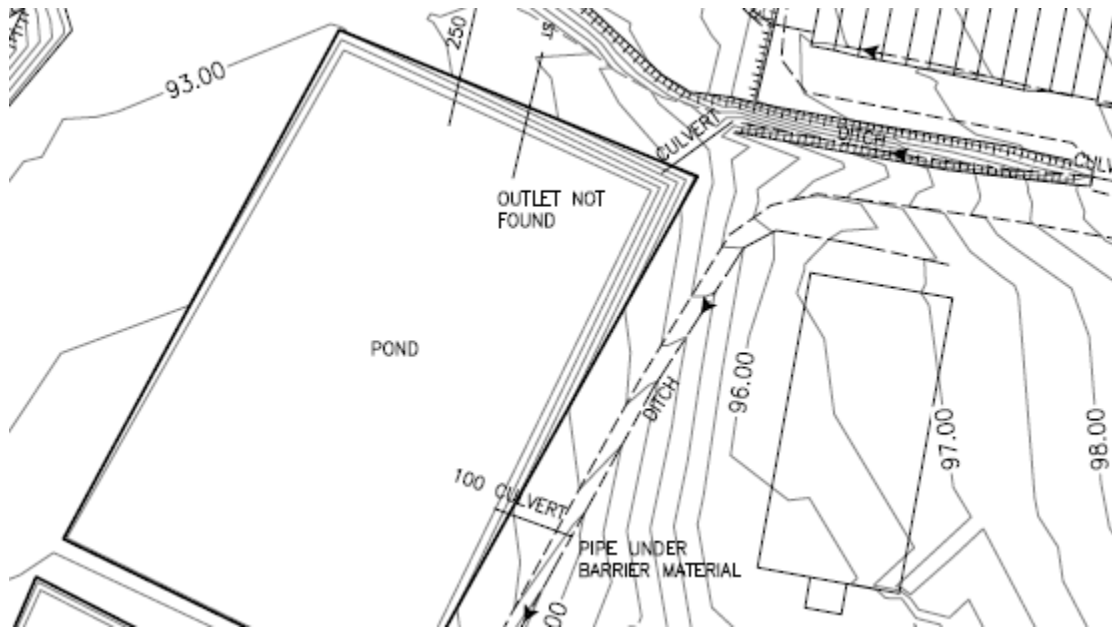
Manure Storage Building Shown in Reference to Pond 2. GIS by Stantec
